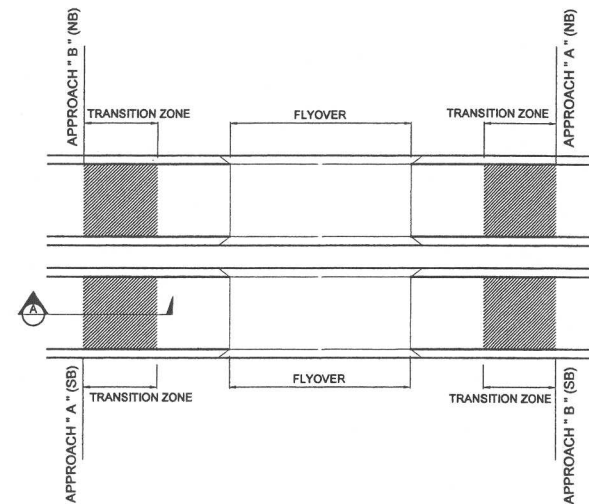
SCHEMATIC PLAN FOR EXISTING FLYOVER
